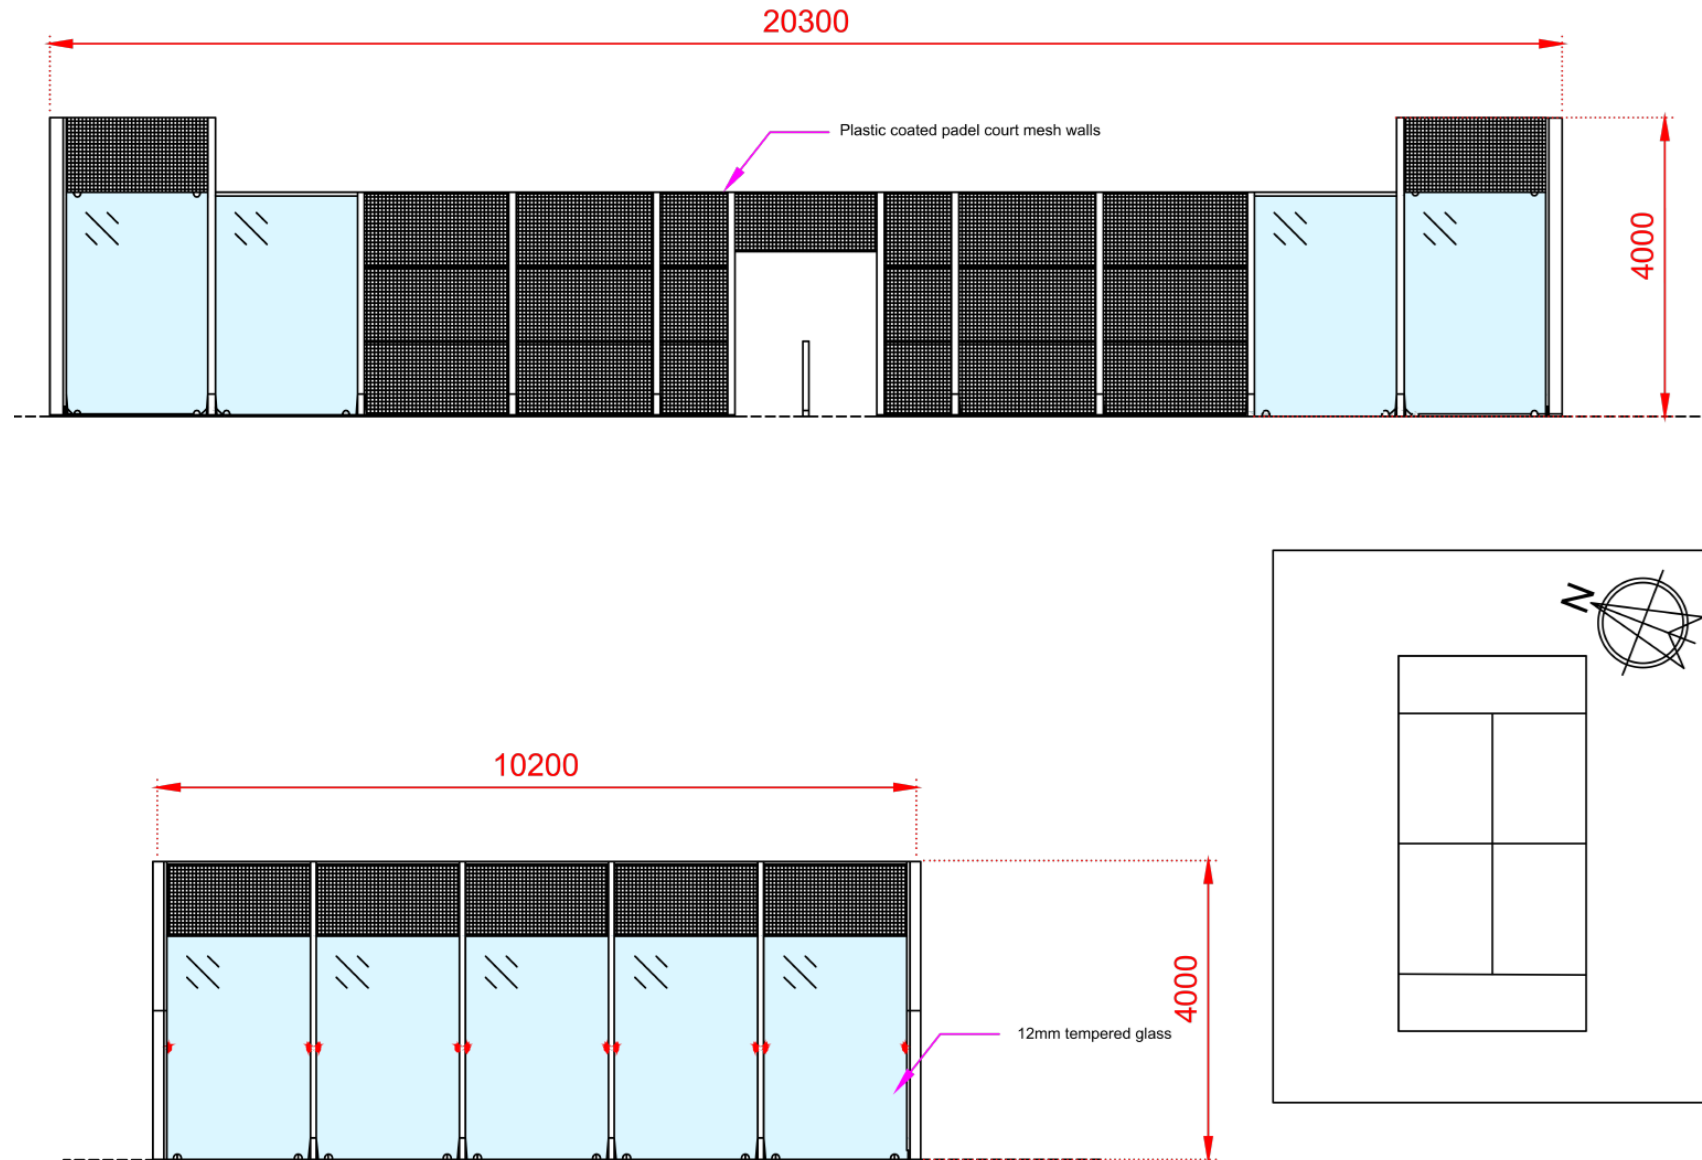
TYPICAL PADEL COURTS PLANS AND ELEVATIONS
